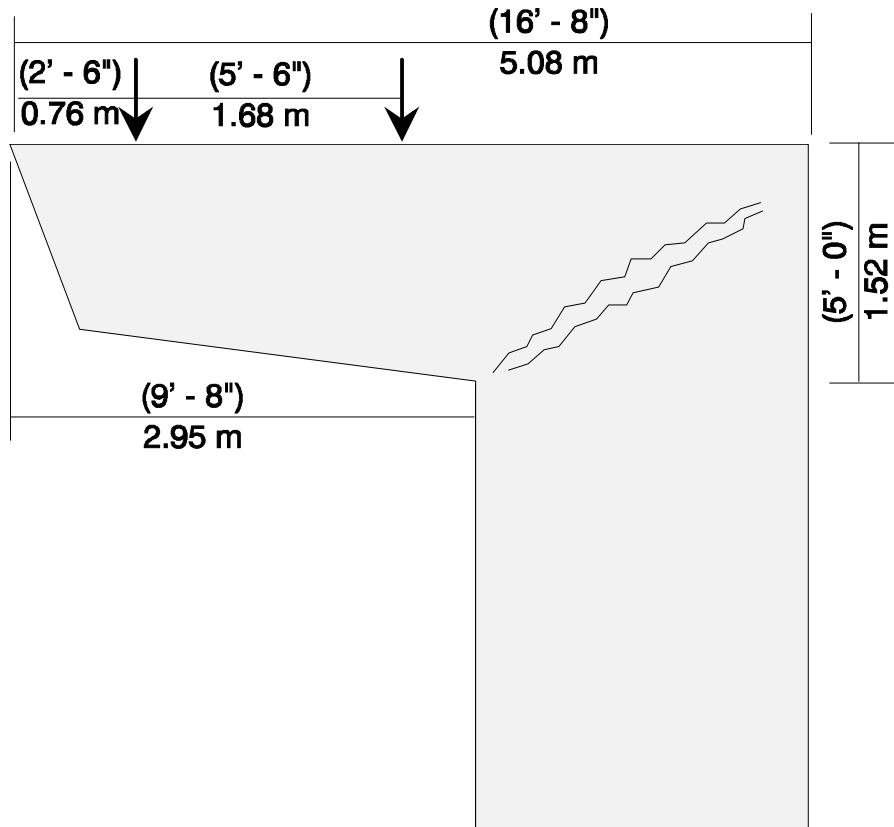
Pattern of Cracks in Pier C-11C
